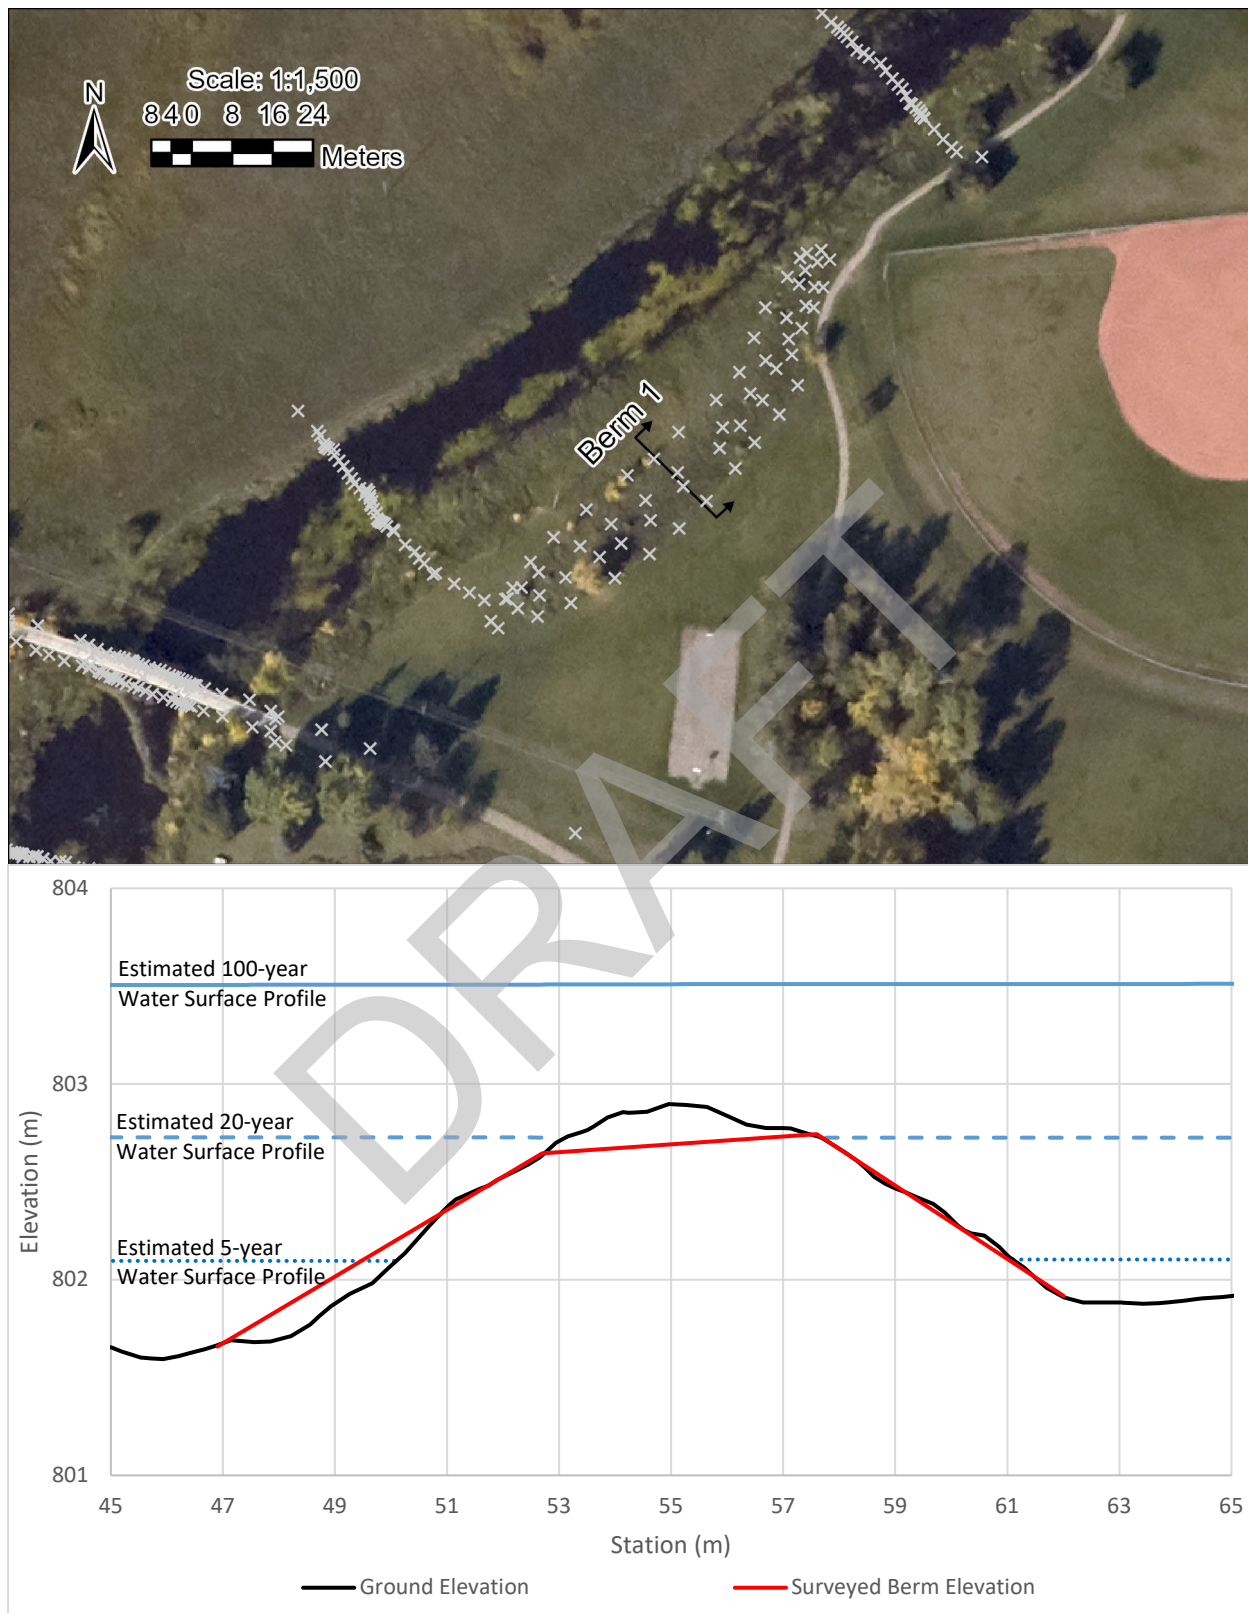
Plan View Schematic of Berm 1 typical sections (DEM and Survey).
